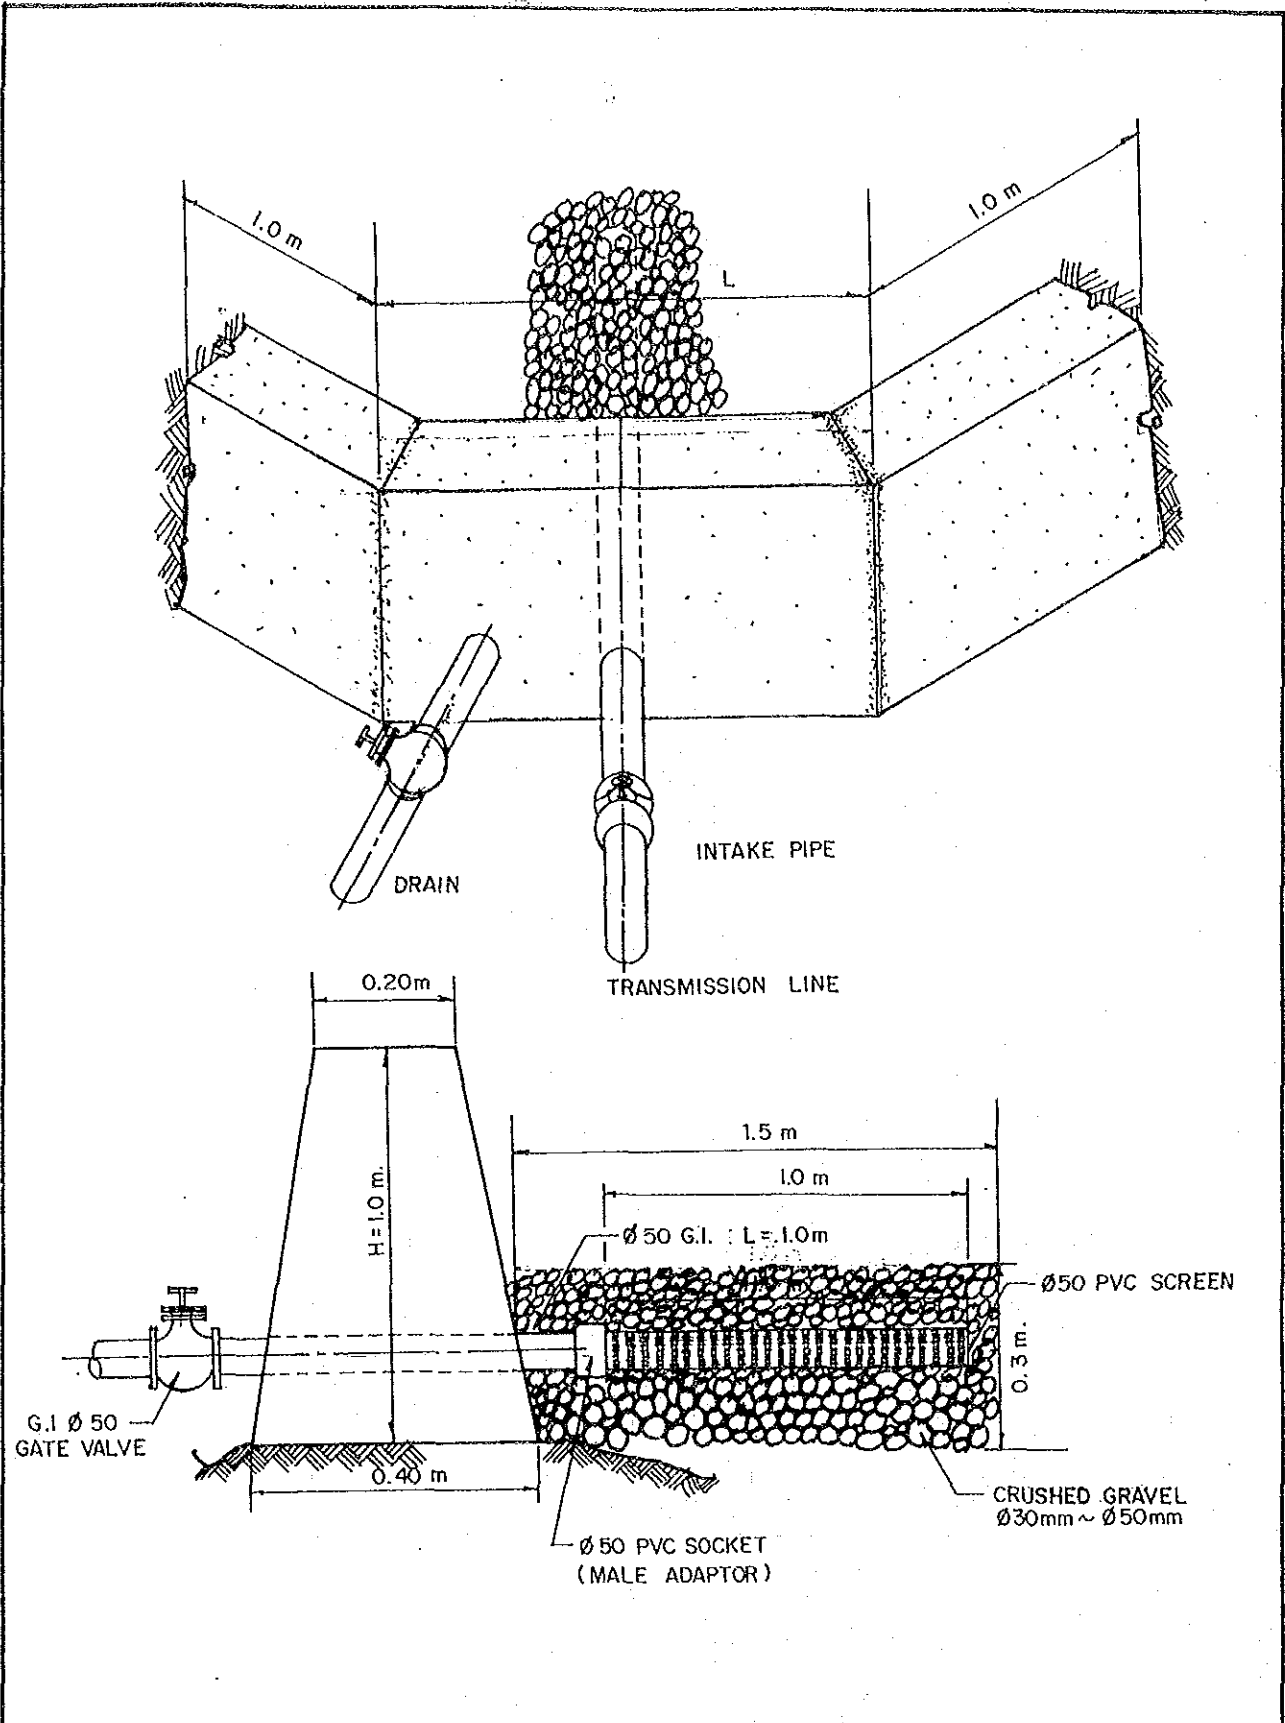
TYPICAL DESIGN OF SMALL INTAKE DAM
